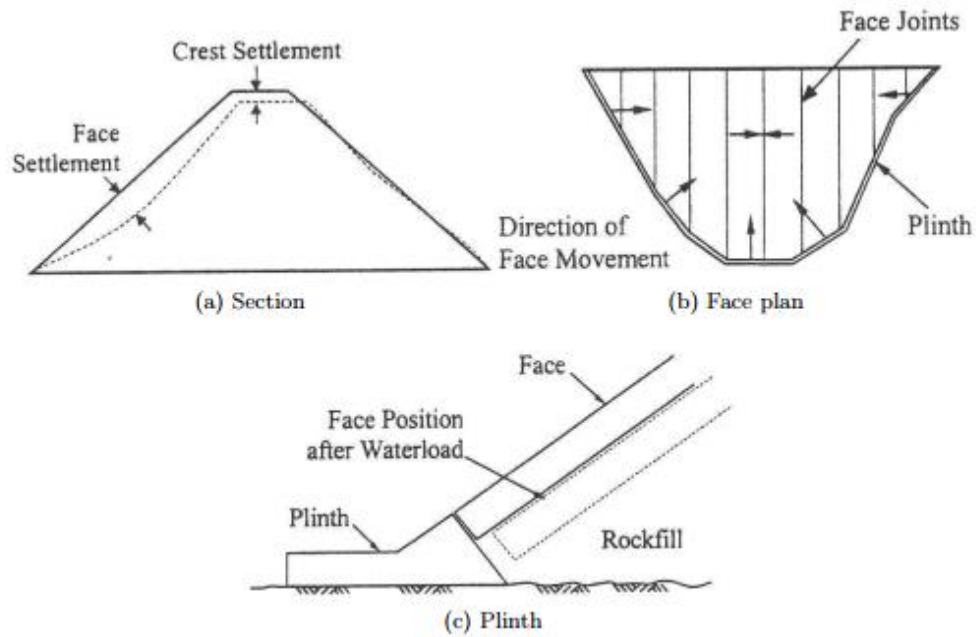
Schema of deformation of a CFRD in 2D under the action of water load
